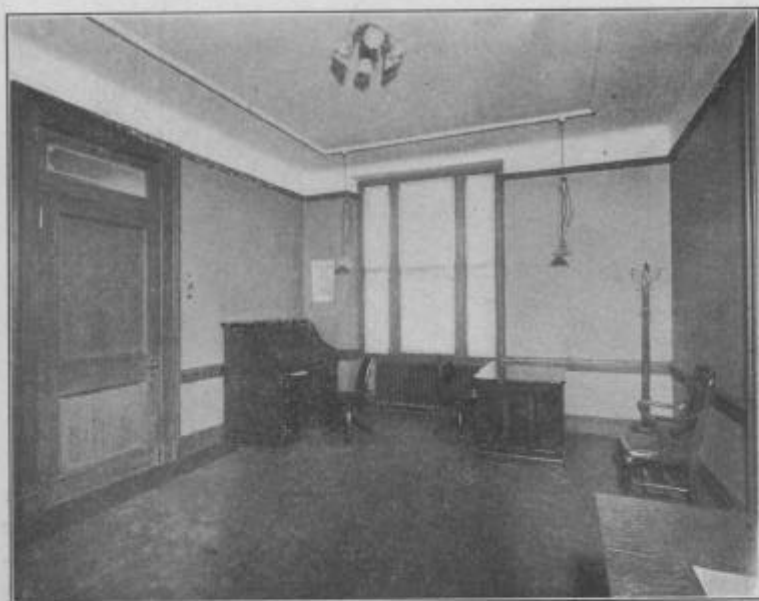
Typical Office, Showing Ceiling Fixture and Special Molding.
